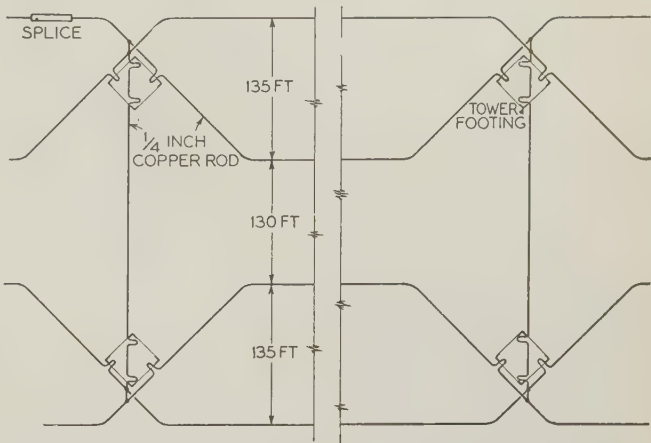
Typical counterpoise layout for single circuit tower section of line
